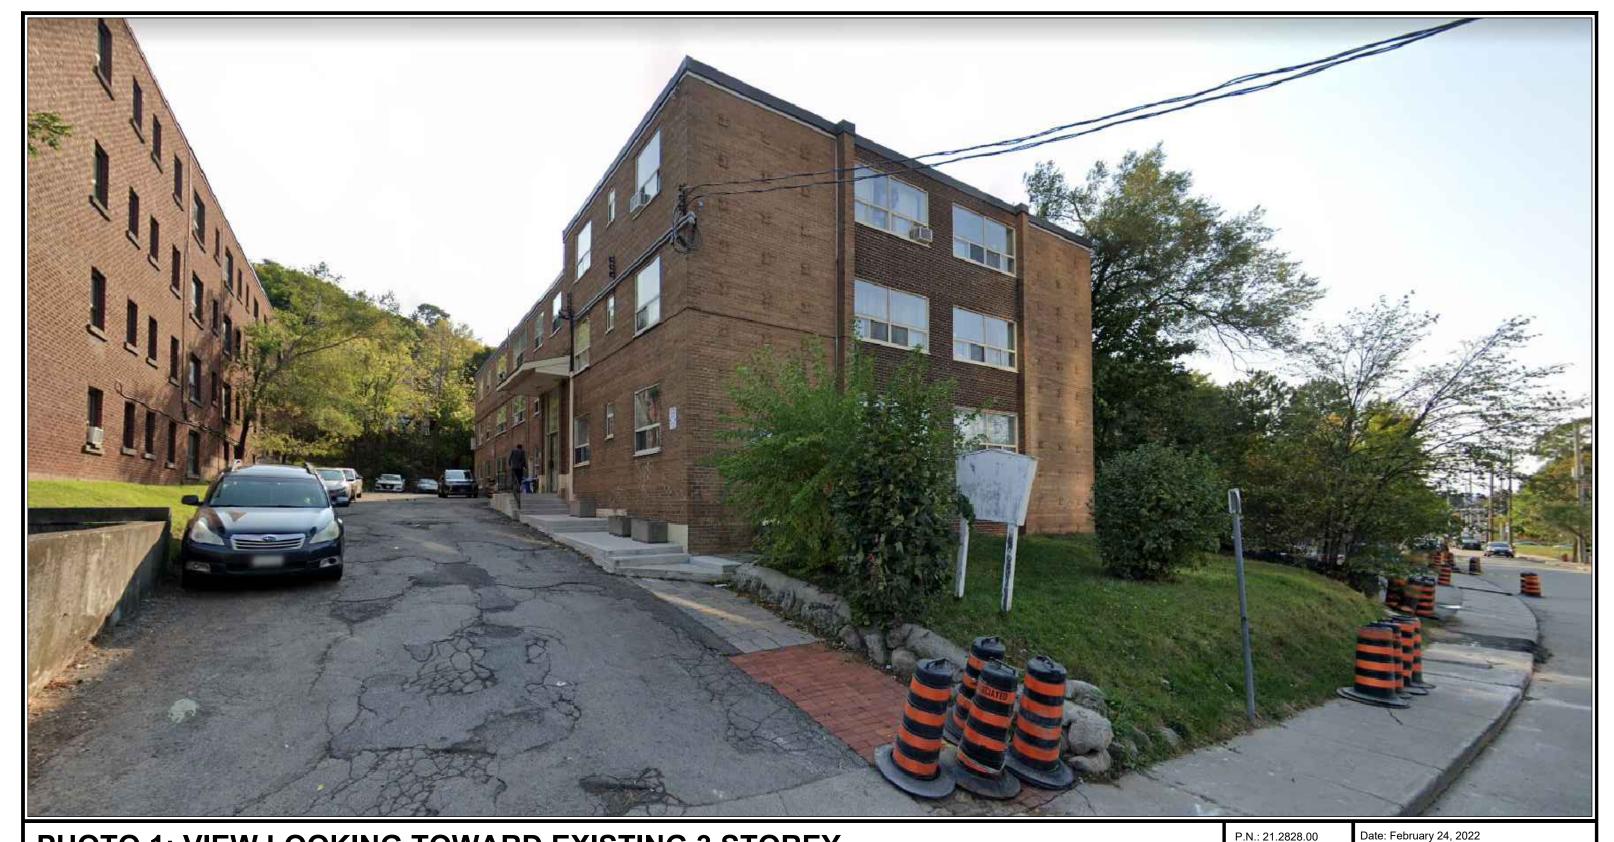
VIEW LOOKING TOWARD EXISTING 3 STOREY RESIDENTIAL APARTMENT BUILDING from ST. JOSEPH'S DRIVE
